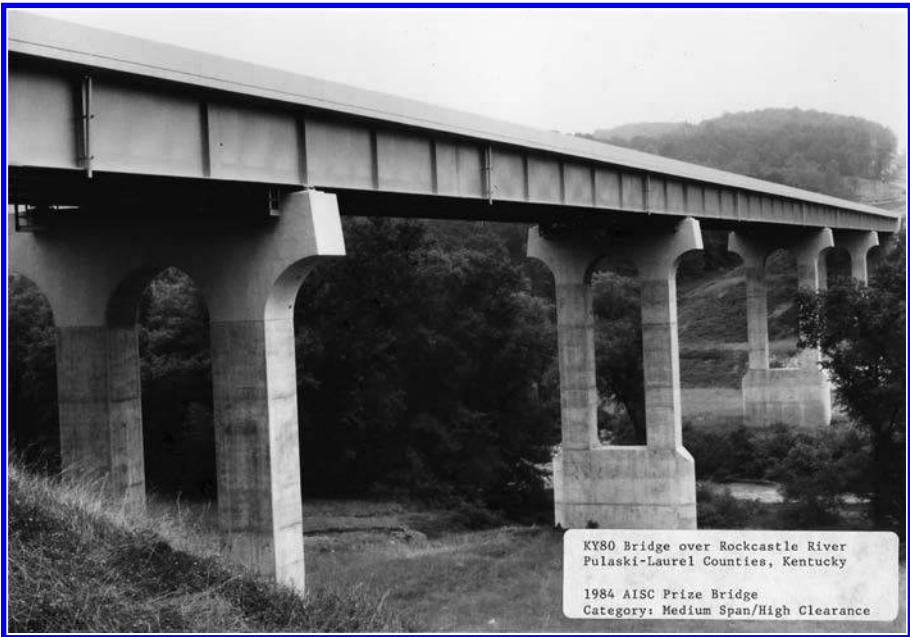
A multispan bridge (a typical plate girder bridge). Photo: KY80 Bridge over Rockcastle River, Pulaski-Laurel Counties, KY. (Courtesy of AISC, Chicago, IL.)
